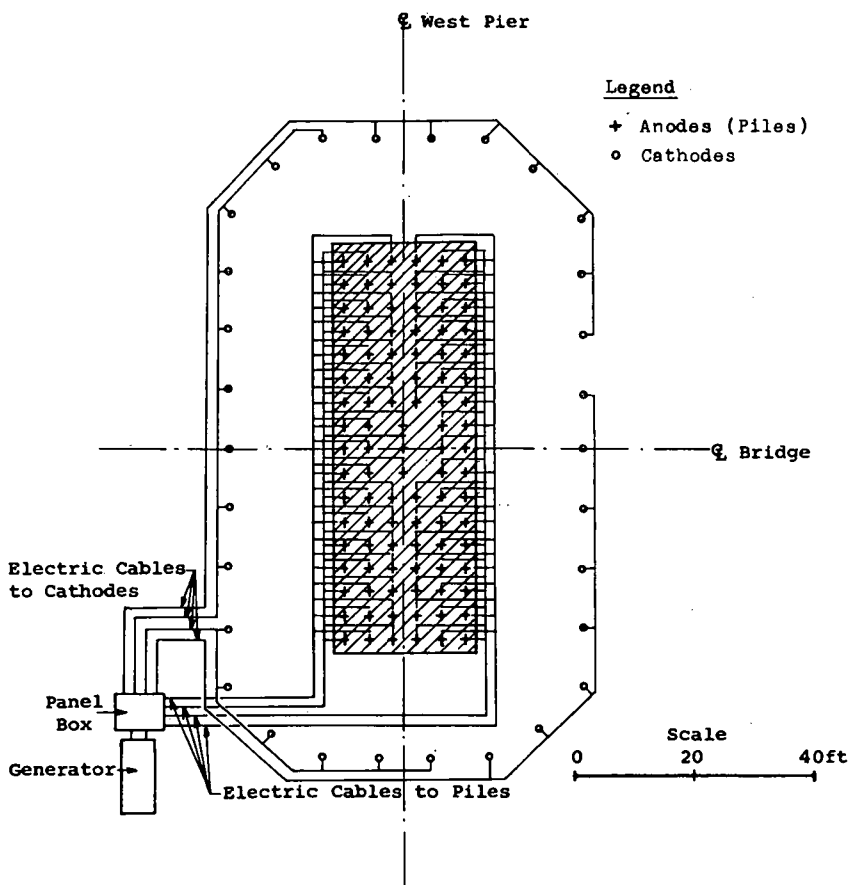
ELECTRODE INSTALLATION FOR TREATMENT OF PILE FOUNDATION, BIG PIC RIVER BRIDGE
